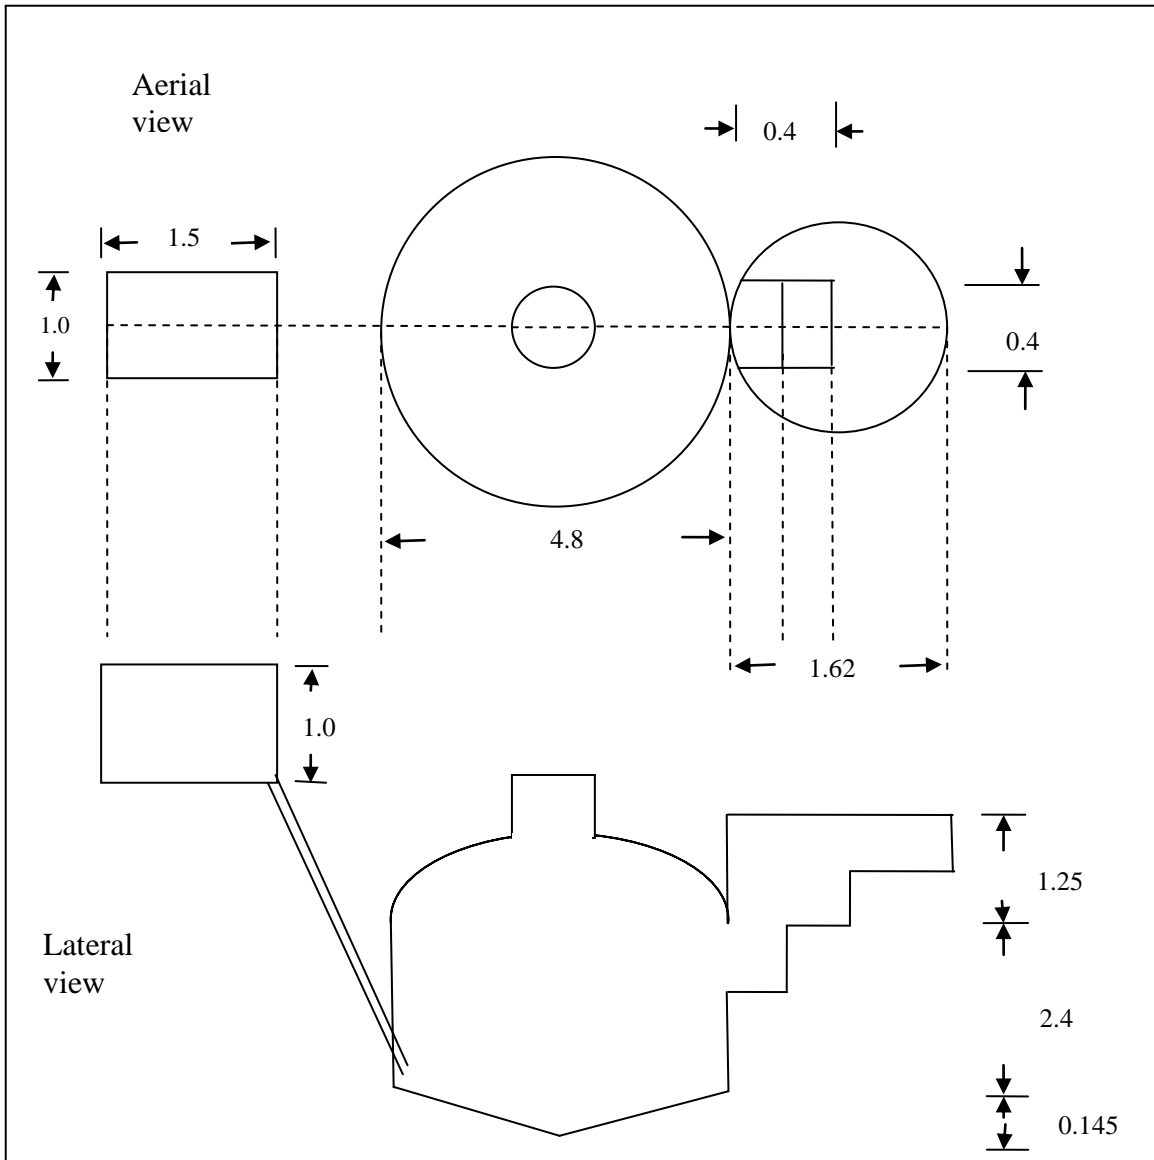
Aerial and lateral view of the digester layout complete with inlet and expansion chamber (all dimensions are in metres)
